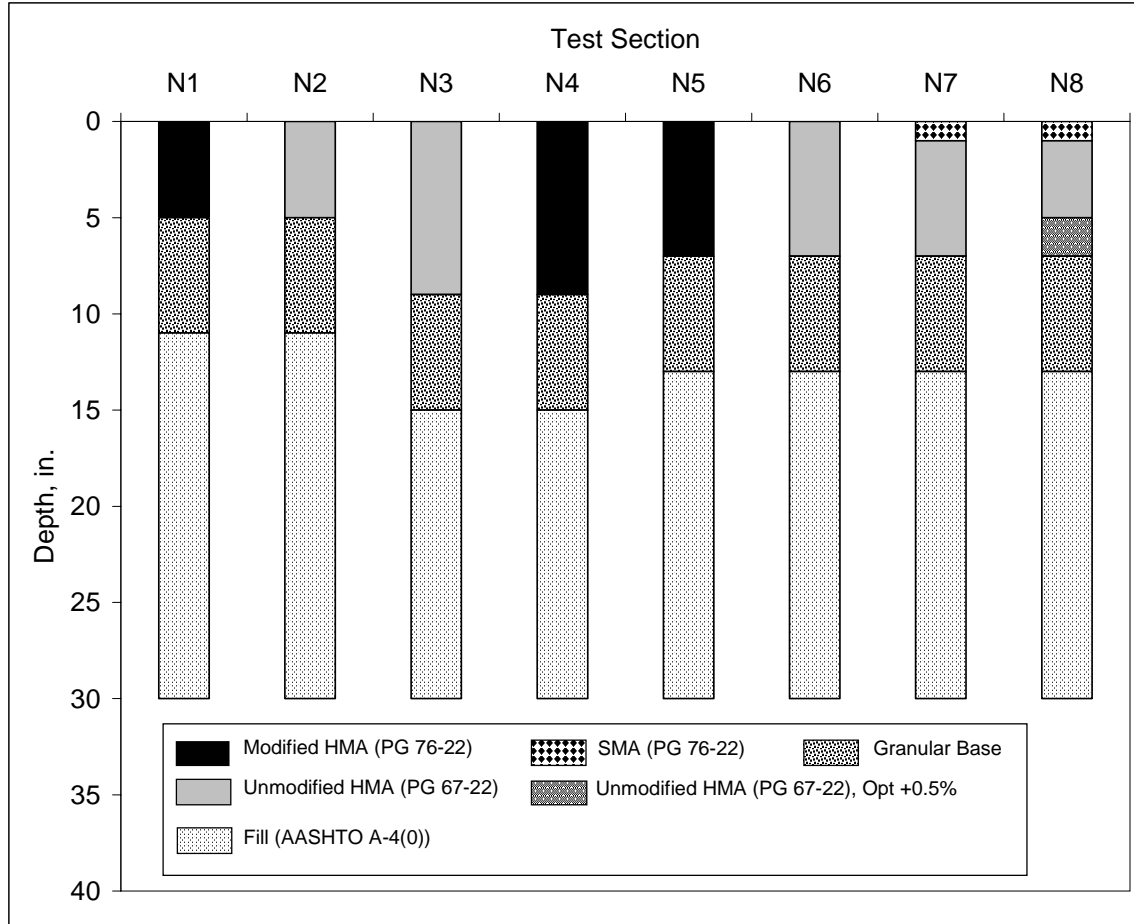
Final Design and Section Layout (after Timm et al, 2005).
